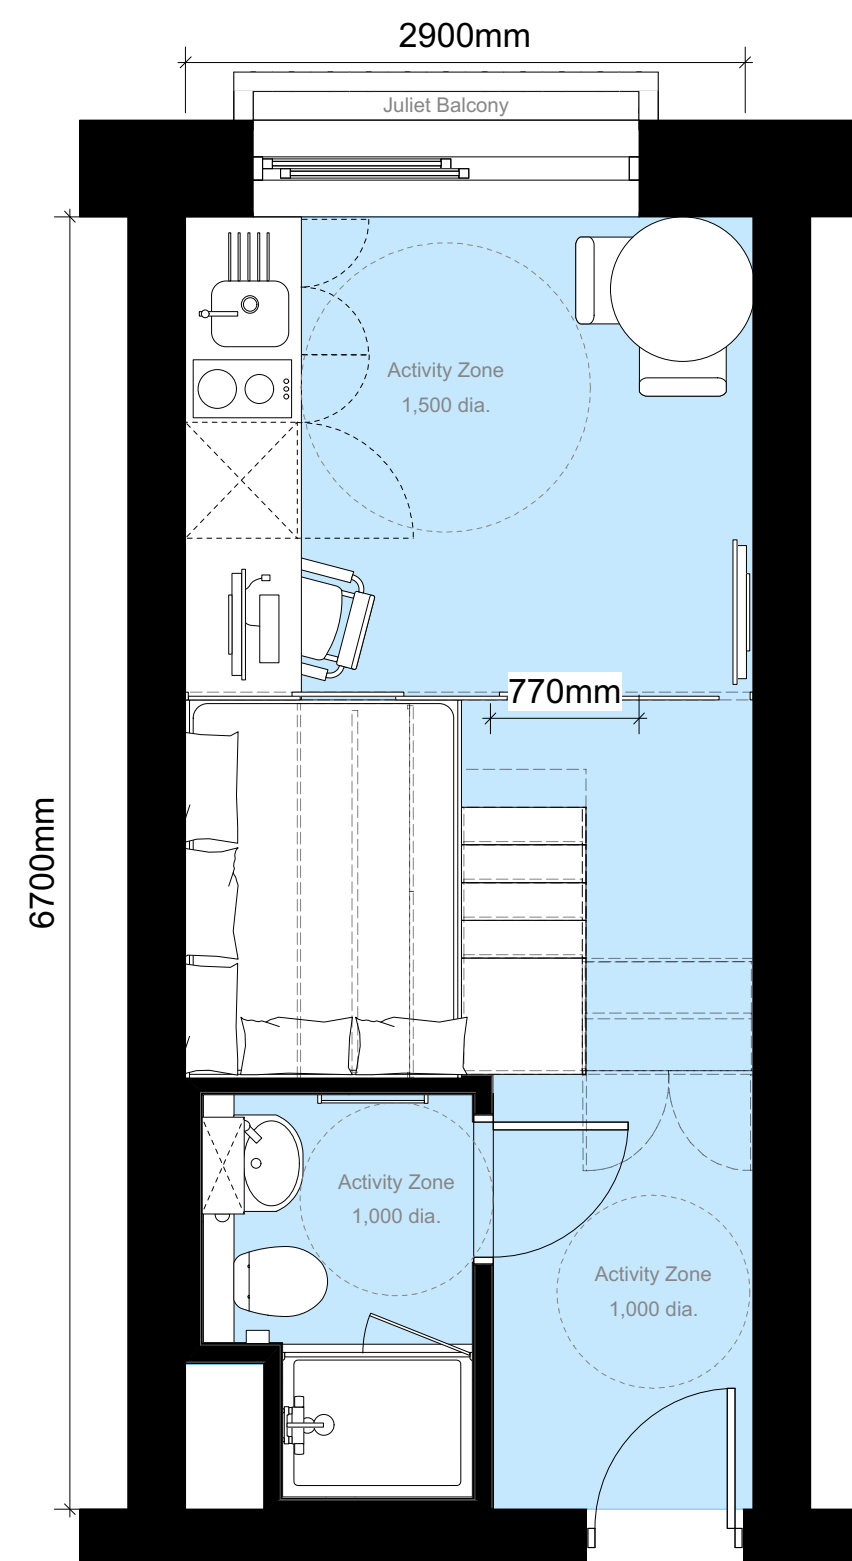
TYPICAL 18SQM ROOM LAYOUT
